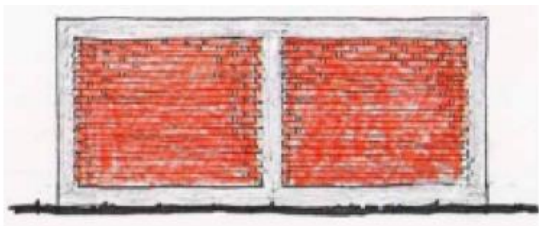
Confined masonry principle, load bearing infill walls (SCG, nd).
